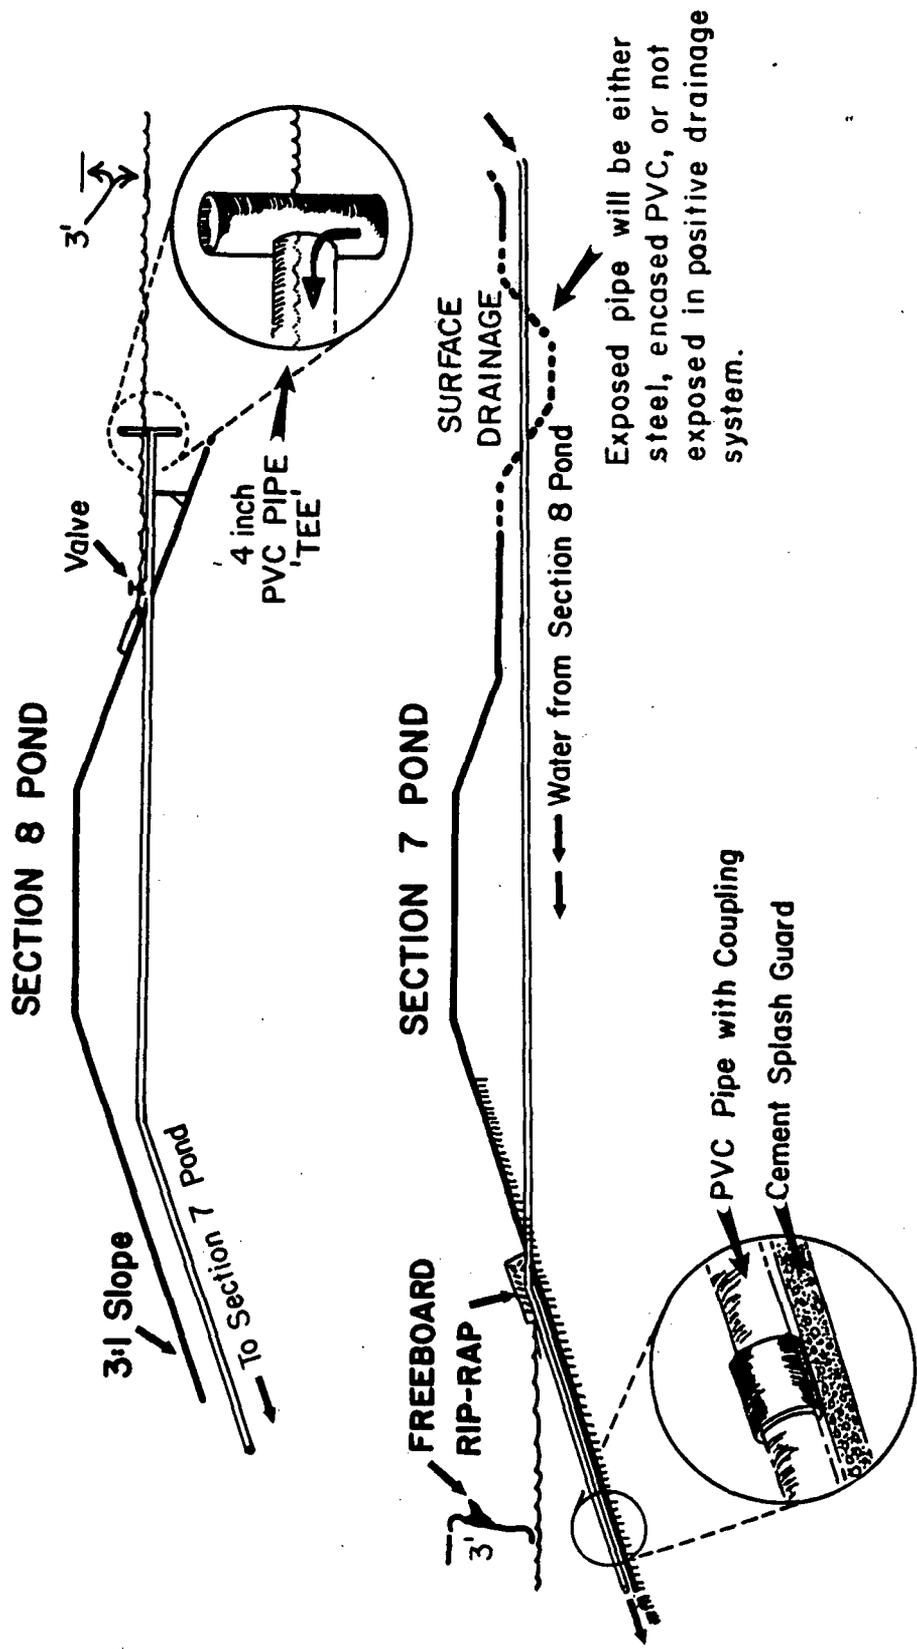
Cross section of ponds showing transfer of water from pit 8 to 7.
